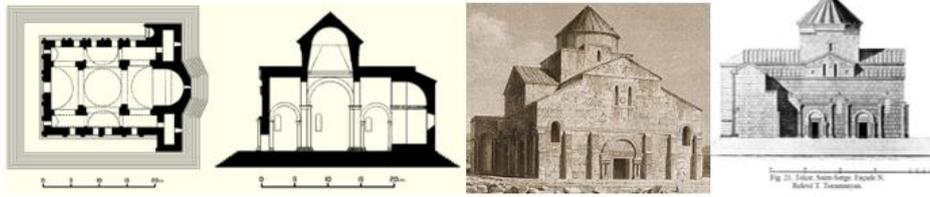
Tekor Church: a) Plan b) Section c) View in the 1840s d) View of Church (Toramanyan, 1911)
